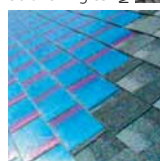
Solutions: Photovoltaic (PV) or solar cells can provide electricity for a house or building using solar-cell roof shingles, as shown in this house in Richmond Surrey, England. Solar-cell roof systems that look like a metal roof are also available. In addition, new thin-film solar cells can be applied to windows and outside glass walls.
